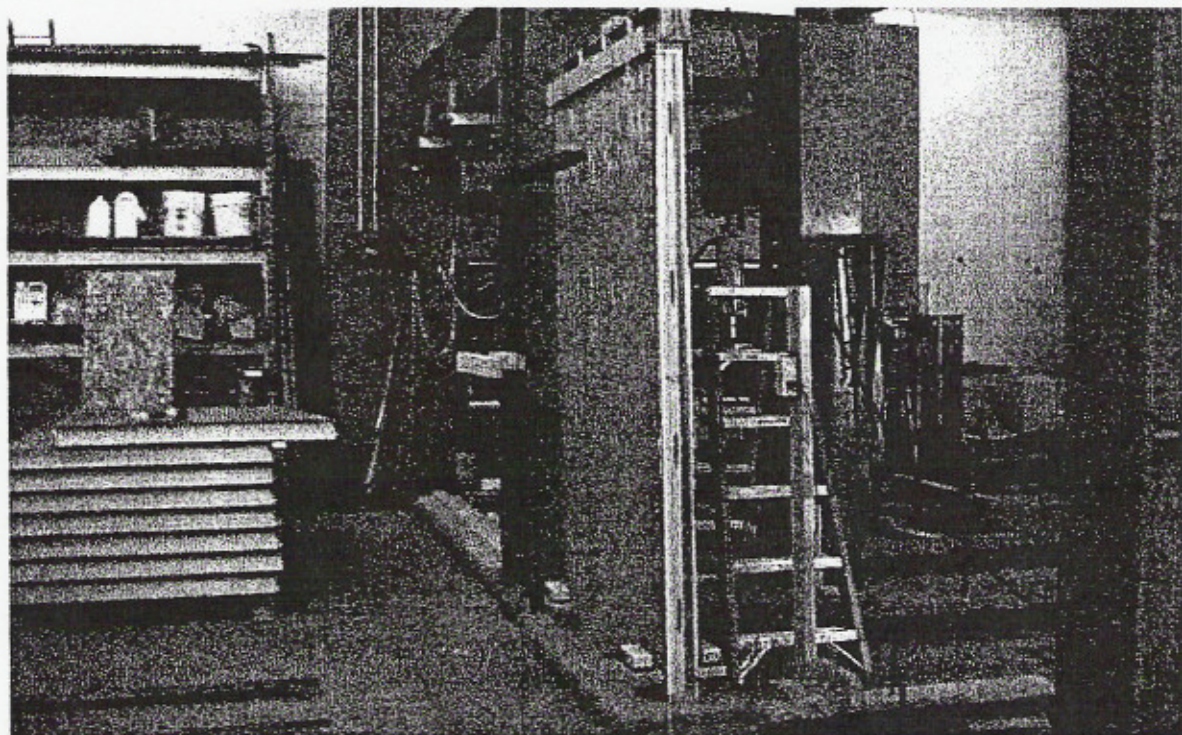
Test Setup for Compressive Loading on 8' OSB-OSB Panel
